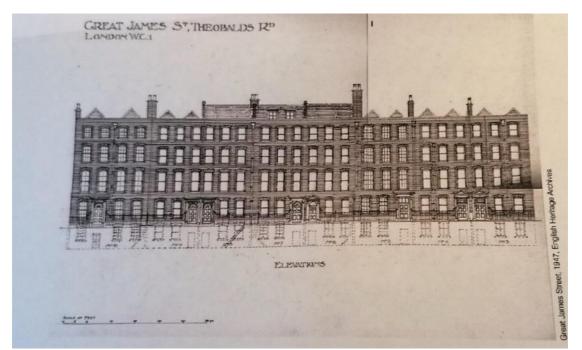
Labelled exterior front elevation of Nos. 3-10 Great James Street [© Historic England Archive MD47/00322]
